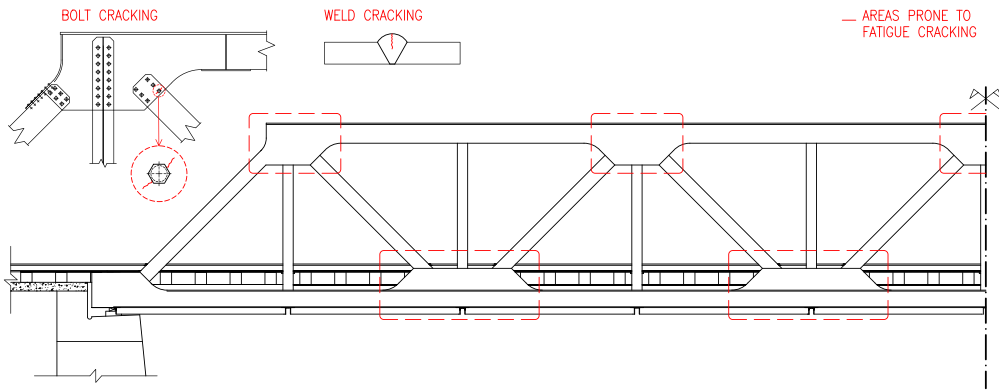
Illustration of areas prone to cracking in both welded and bolted connections of Warren-type steel railway truss bridges.
